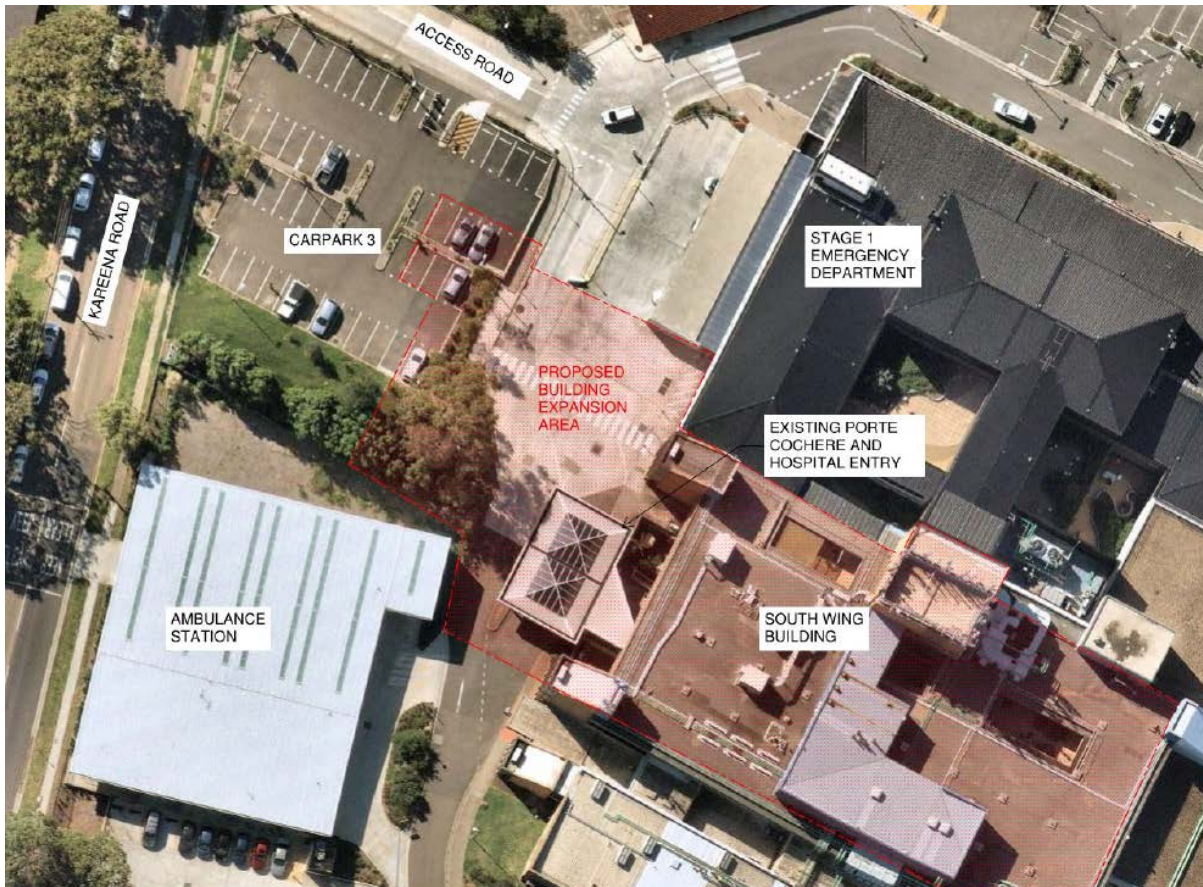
Aerial photograph showing the immediate surrounds of the area subject to the proposed development
